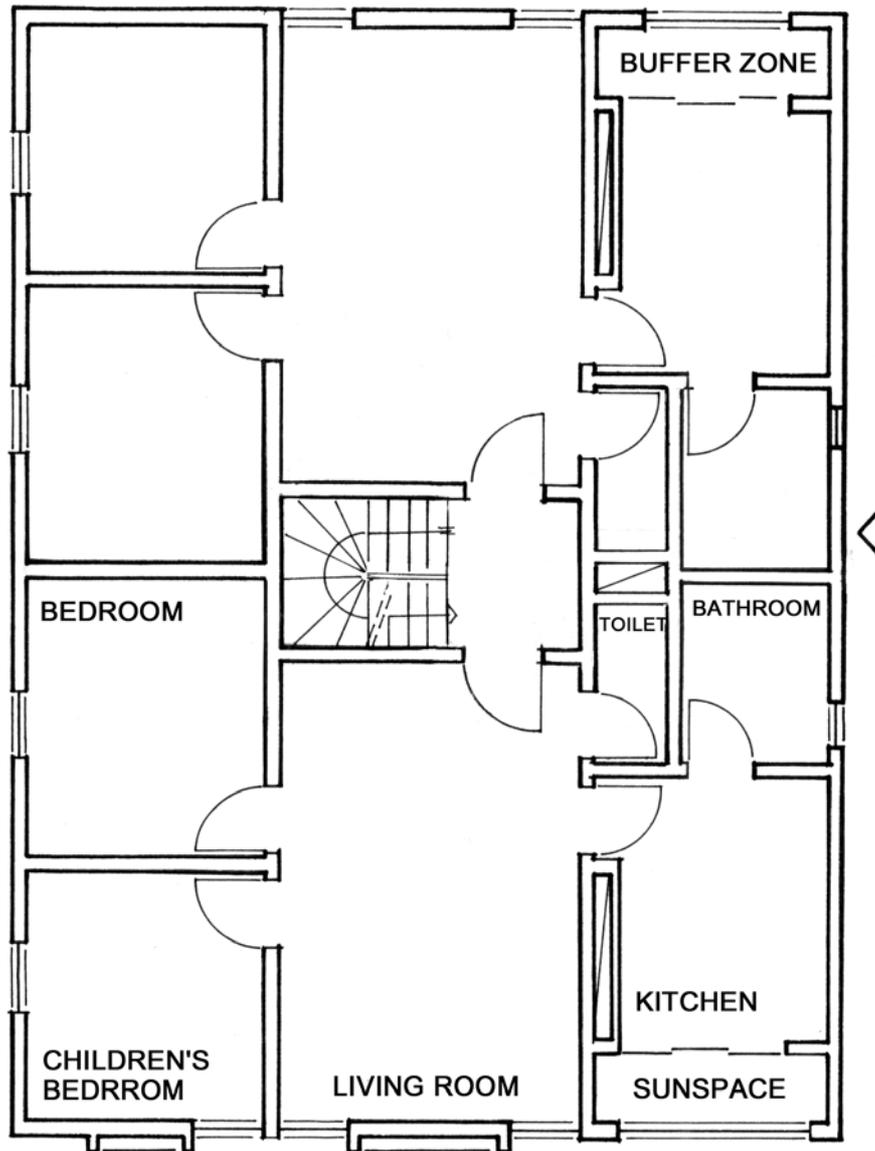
Plan of type D₅ dwelling (multi-storeyed housing); Scale 1/100
